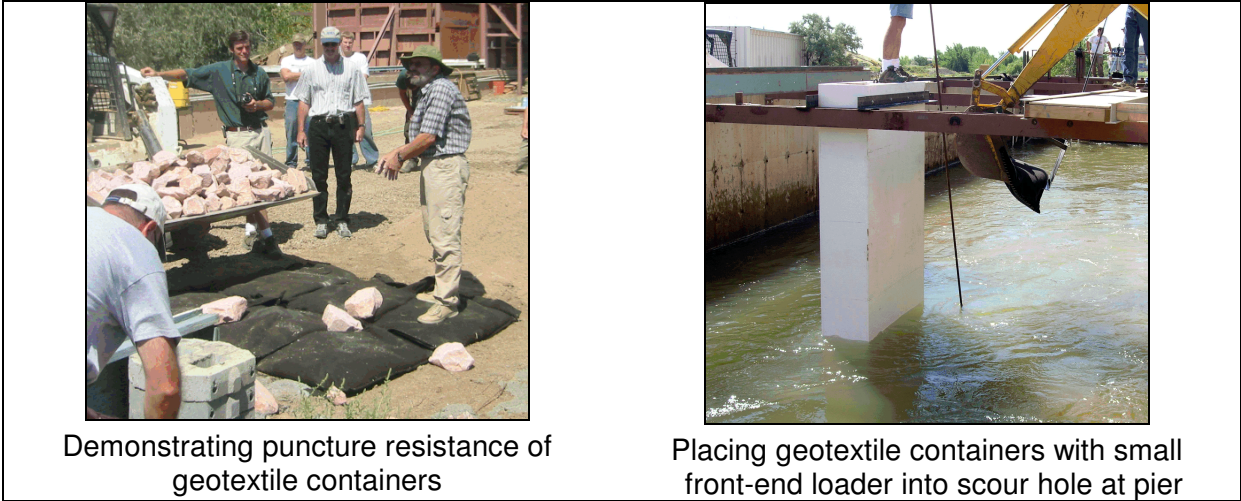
Two hundred lb (91 kg) sand-filled geotextile containers, NCHRP Project 24-07(2).
